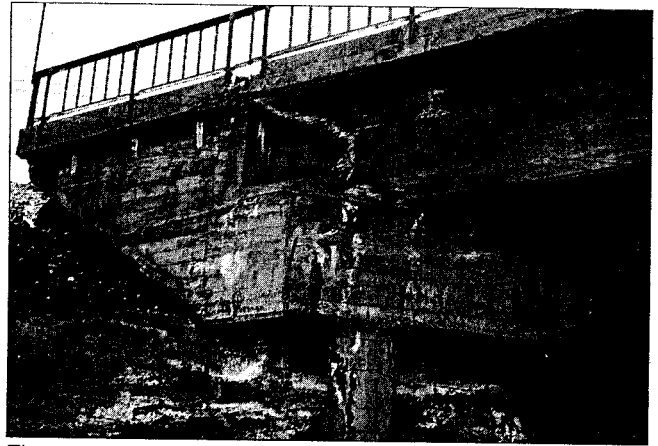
Cracking of the bridge piers of a three-span reinforced concrete bridge on the south-west highway.
